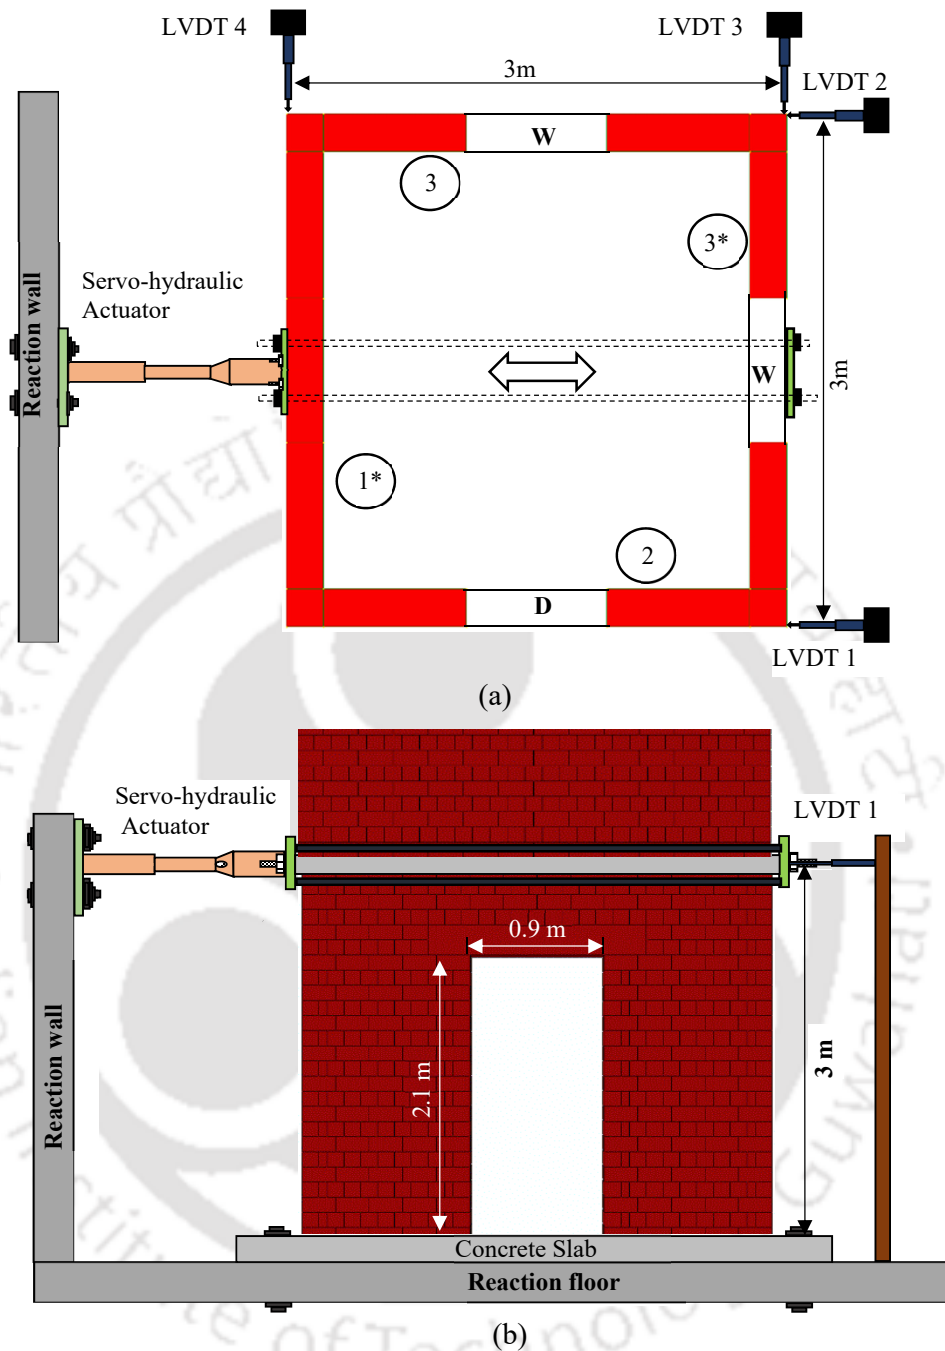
Experimental setup: (a) Plan, and (b) Elevation of the building showing loading arrangement, sensors, and openings in the walls.
